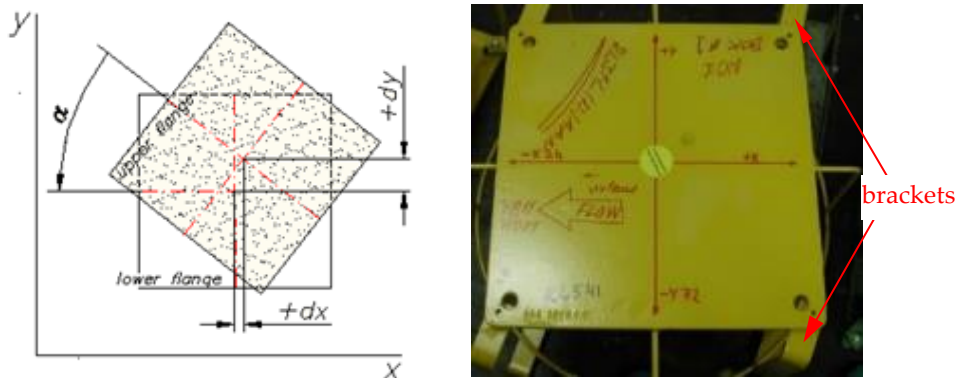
Example of damper pre-setting: (a) scheme of shifting and rotation of damper flanges; (b) real damper with shifted flanges
